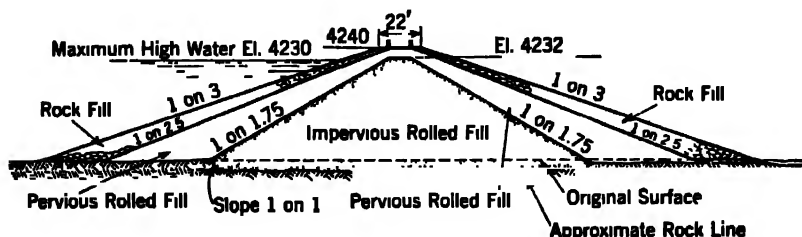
North and South Dikes, Conchas Dam, New Mexico. (From "Design and Construction of Conchas Dam," U. S. Engineer Office, Caddo, Colo.)
